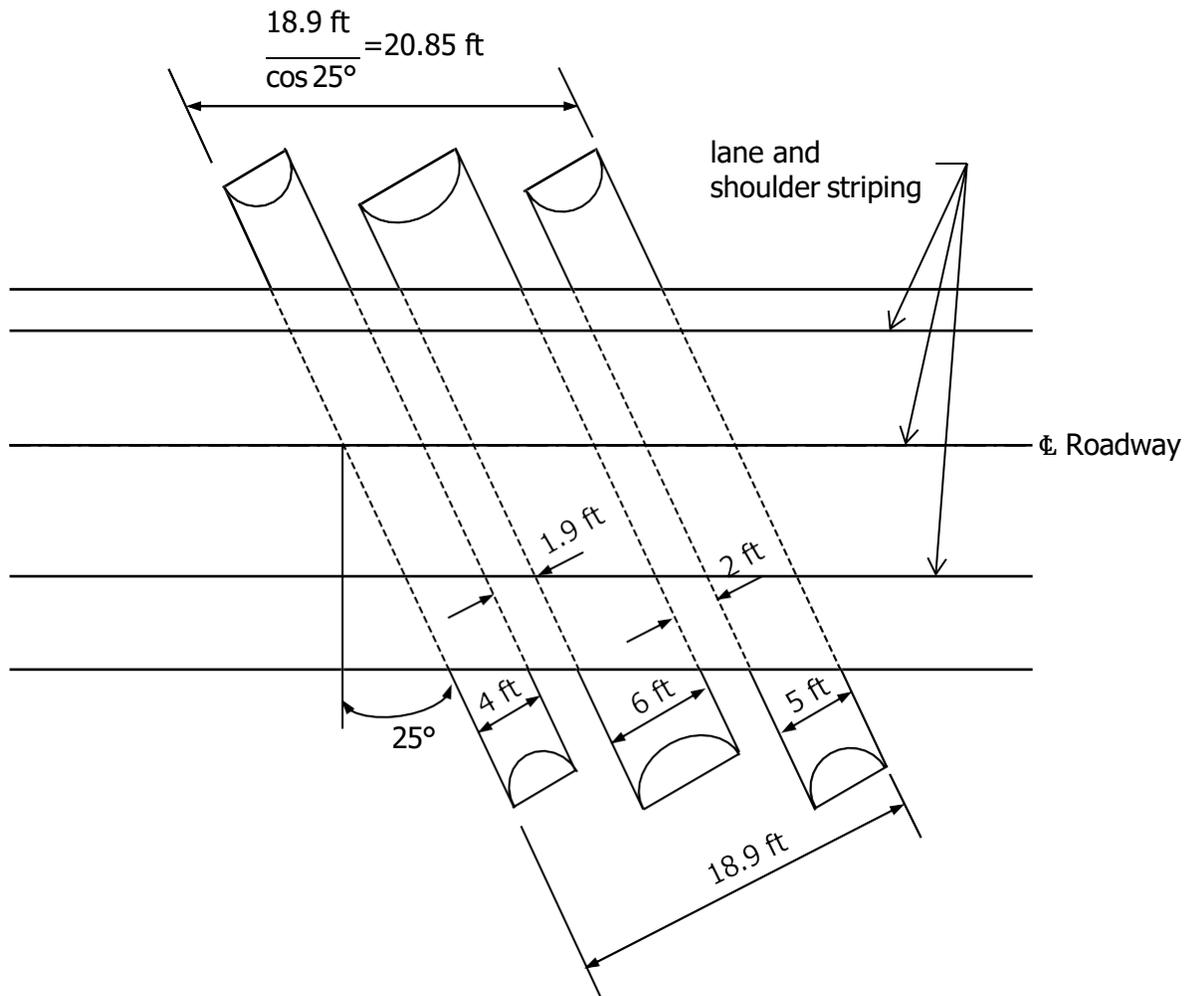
Plan view of a skewed, multi-pipe culvert under fill.
